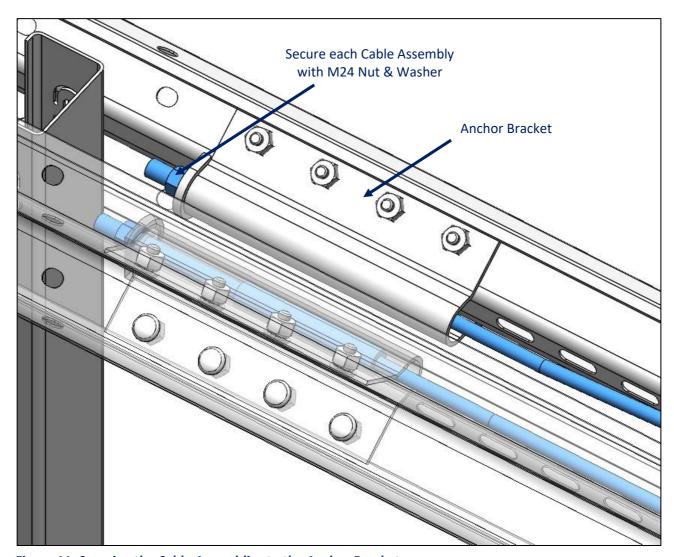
Securing the Cable Assemblies to the Anchor Brackets
